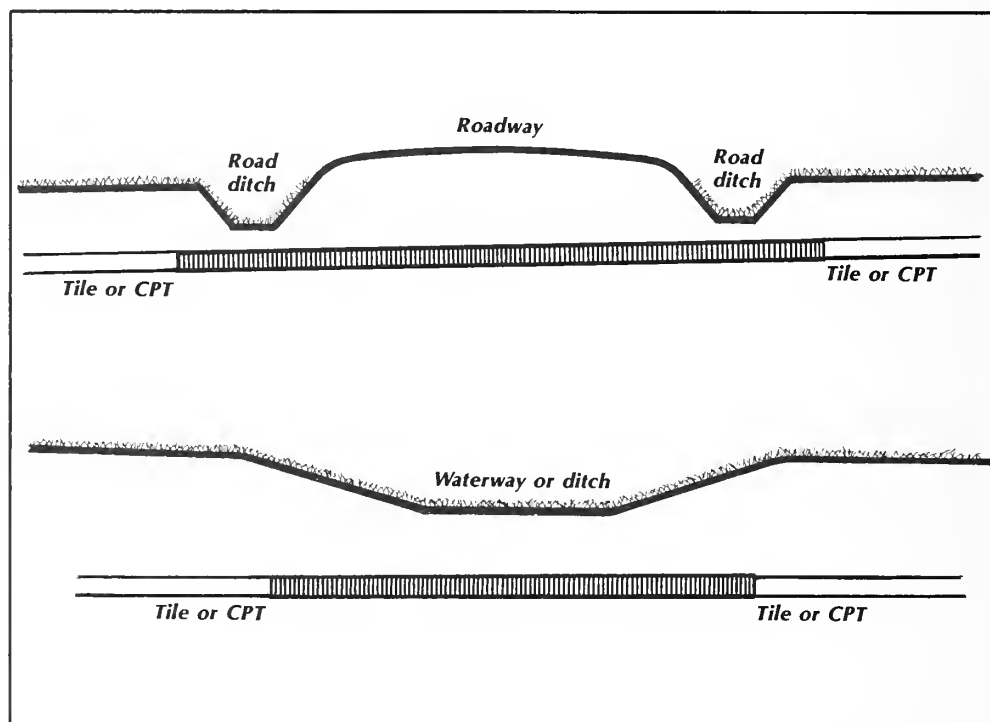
Drains that cross under roads, waterways, or ditches should be constructed of metal pipe, extra-strength sewer tile with cemented joints, or drain tile encased in 4 inches of concrete.
